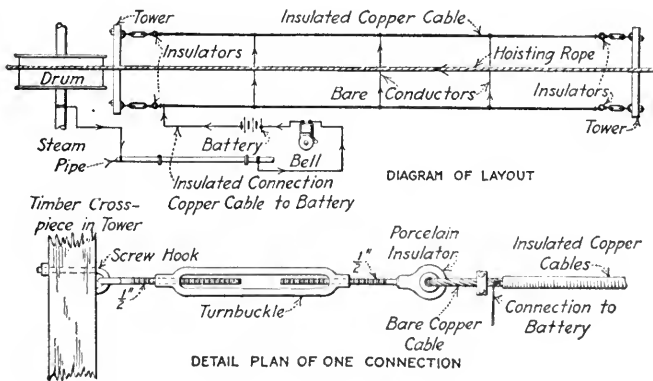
ELECTRIC SIGNAL ARRANGEMENT FOR HOISTING ROPE.
